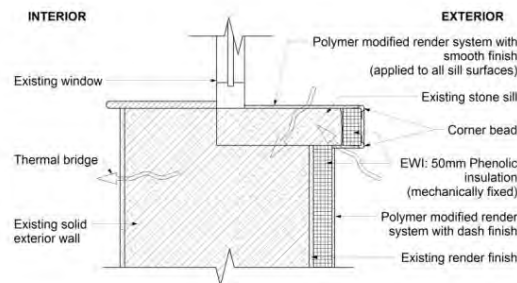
Section detail - Stone window sill (Method used for Case study A)
